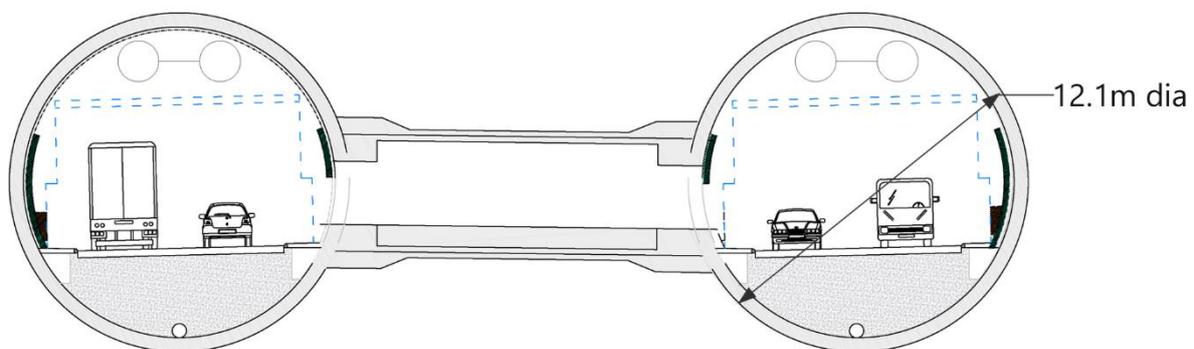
BORED TUNNEL CROSS SECTION AT LOCATION C
